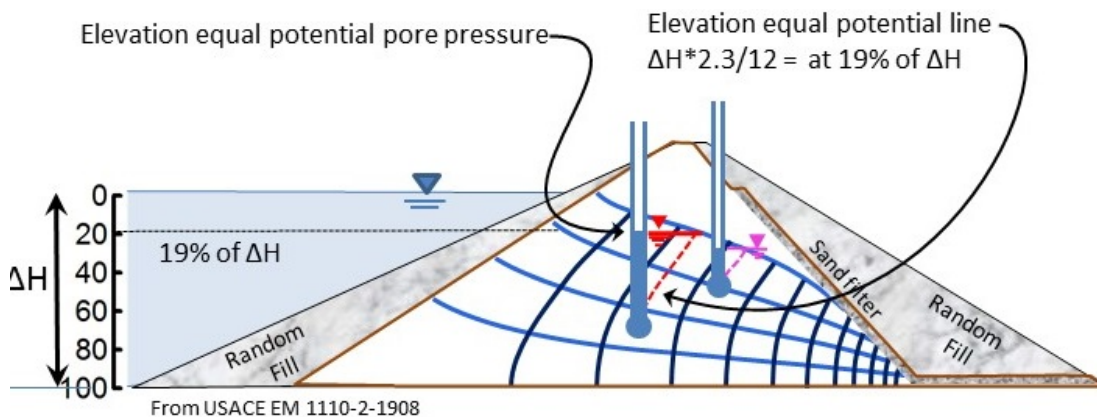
Elevation pore pressure for piezometers in an earth dam clay core.
